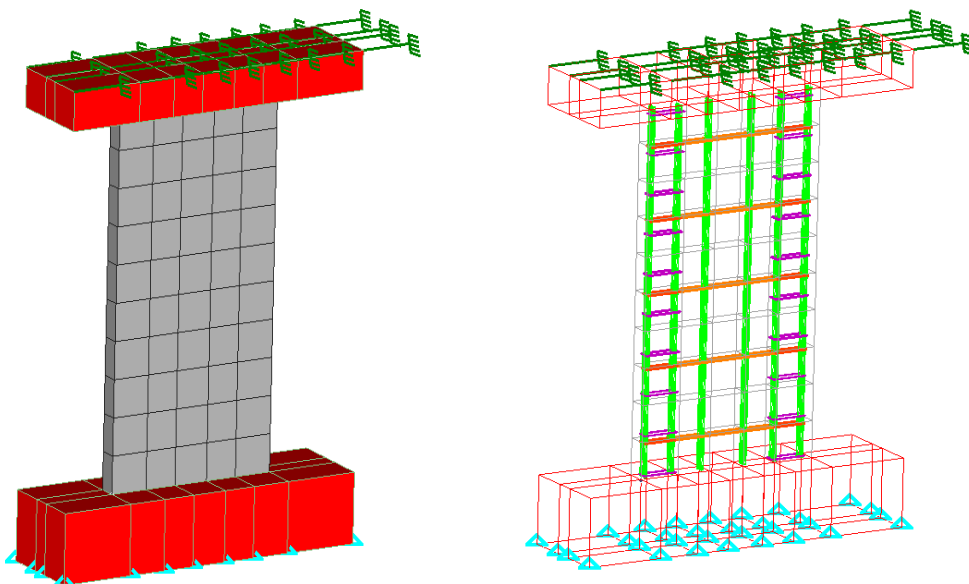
Shear wall SW4. 3D views of the finite element meshes of concrete and embedded rebar elements.
